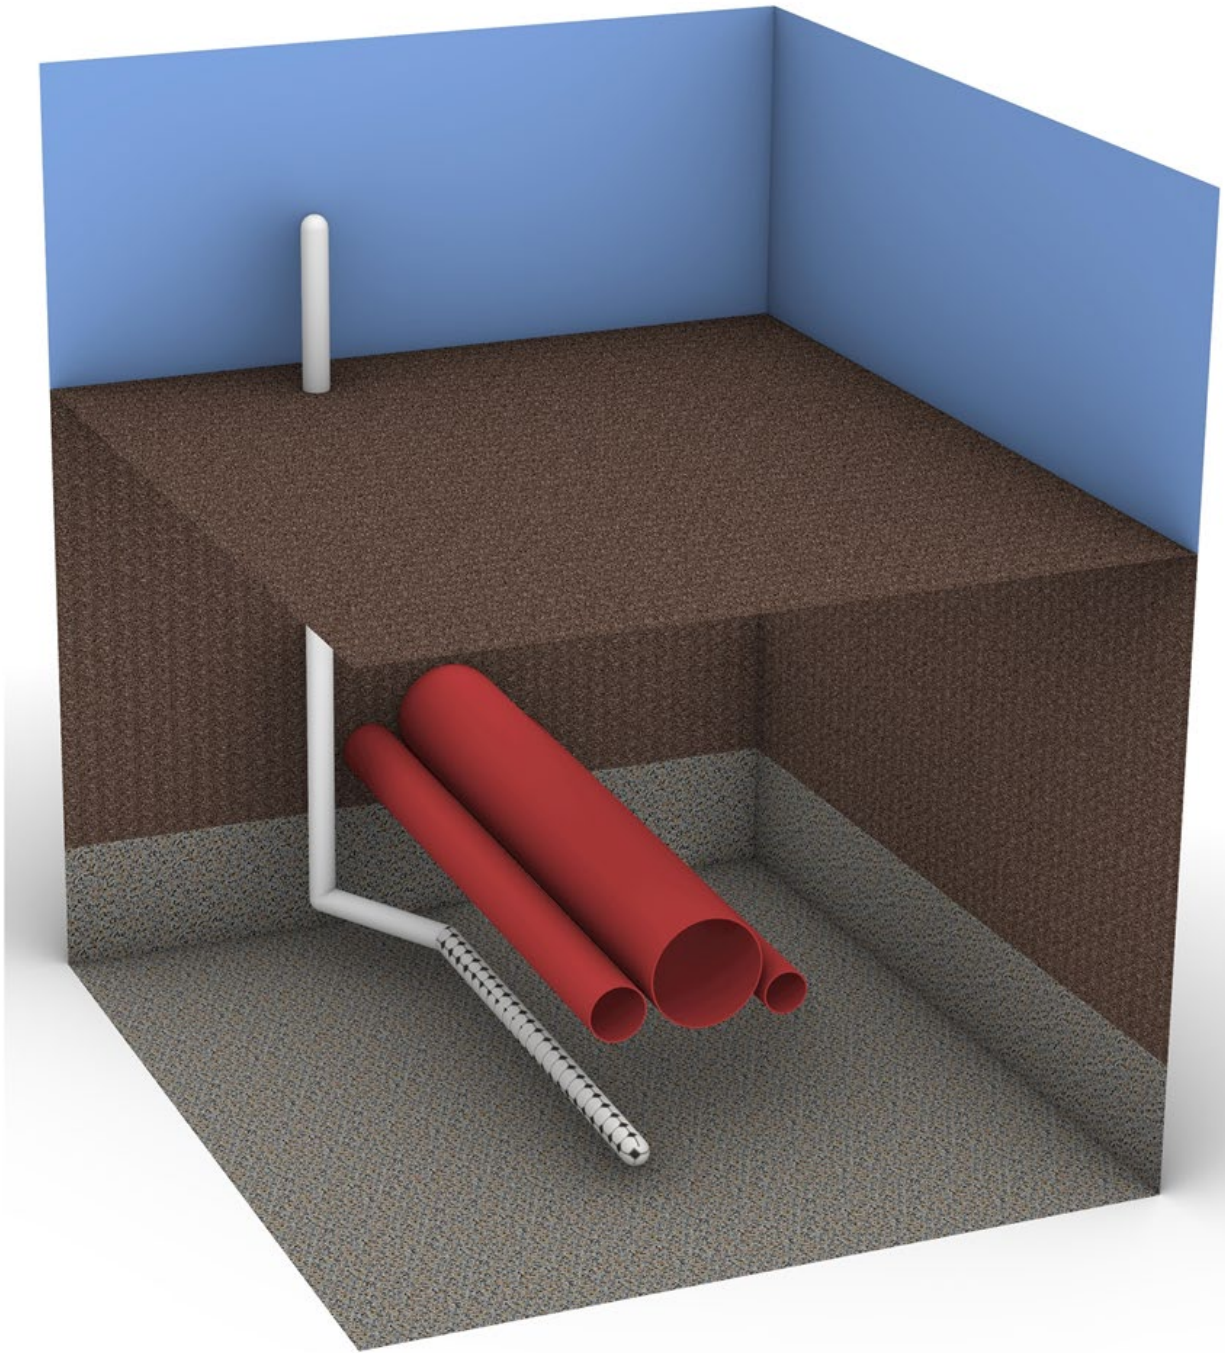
Proposed Leak Detection System at TUA #1, the Lower Boring Location: Red pipelines are buried commodity lines; white pipe is leak detection line installed and perforated under the commodity lines and extending to just above ground surface for monitoring.
